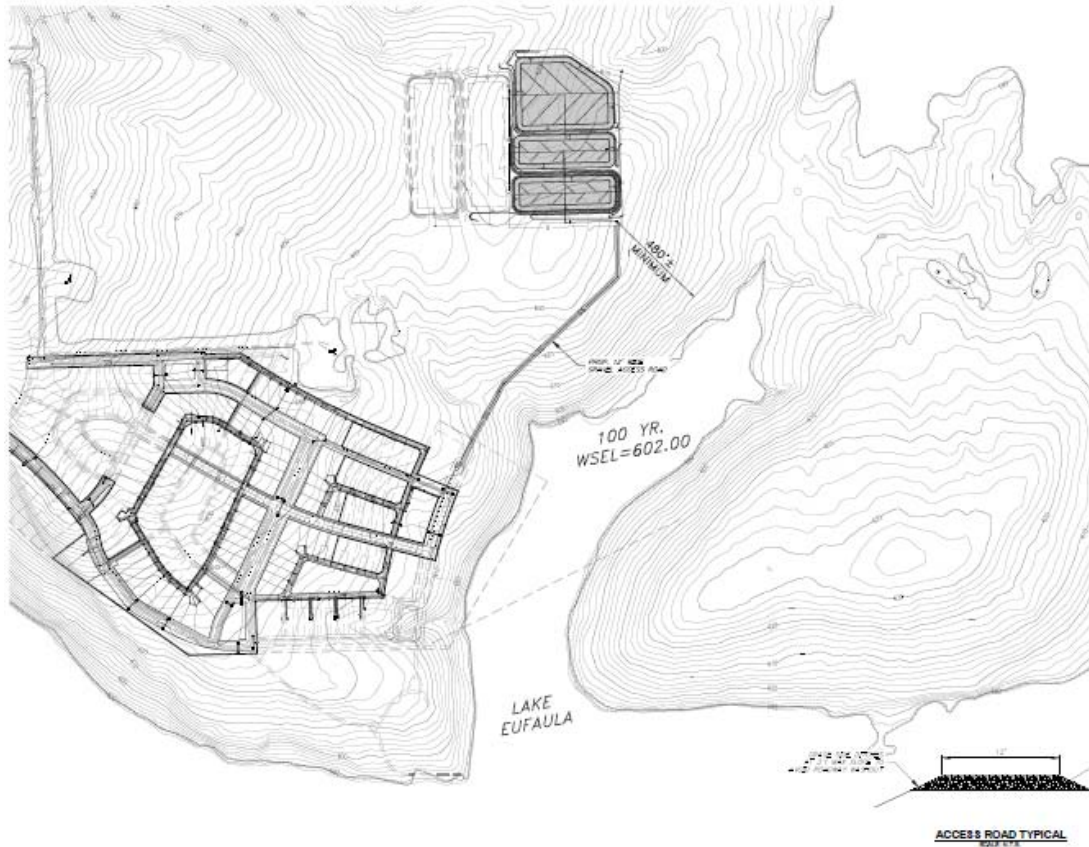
Carlton Landing Proposed Development Lagoon Sewer Treatment System Plan
